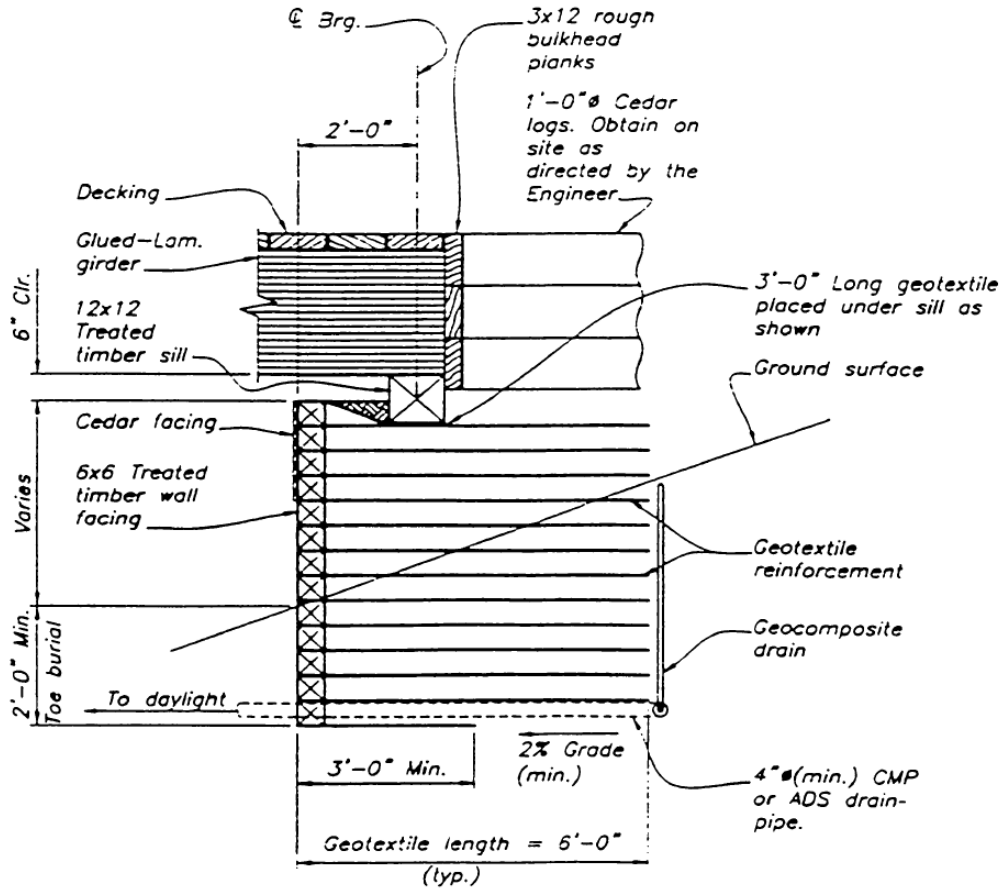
Feather Falls GRS Abutment Schematic Keller, G. R., and Devin, S. C. (2003). "Geosynthetic-Reinforced Soil Bridge Abutments." Transportation Research Board, Washington, D.C. Used under fair use, 2014.
